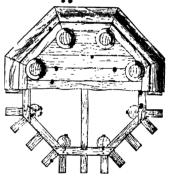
Half Plan of Pulpit Base and Half Horizontal Section at B (Fig. 1850).
